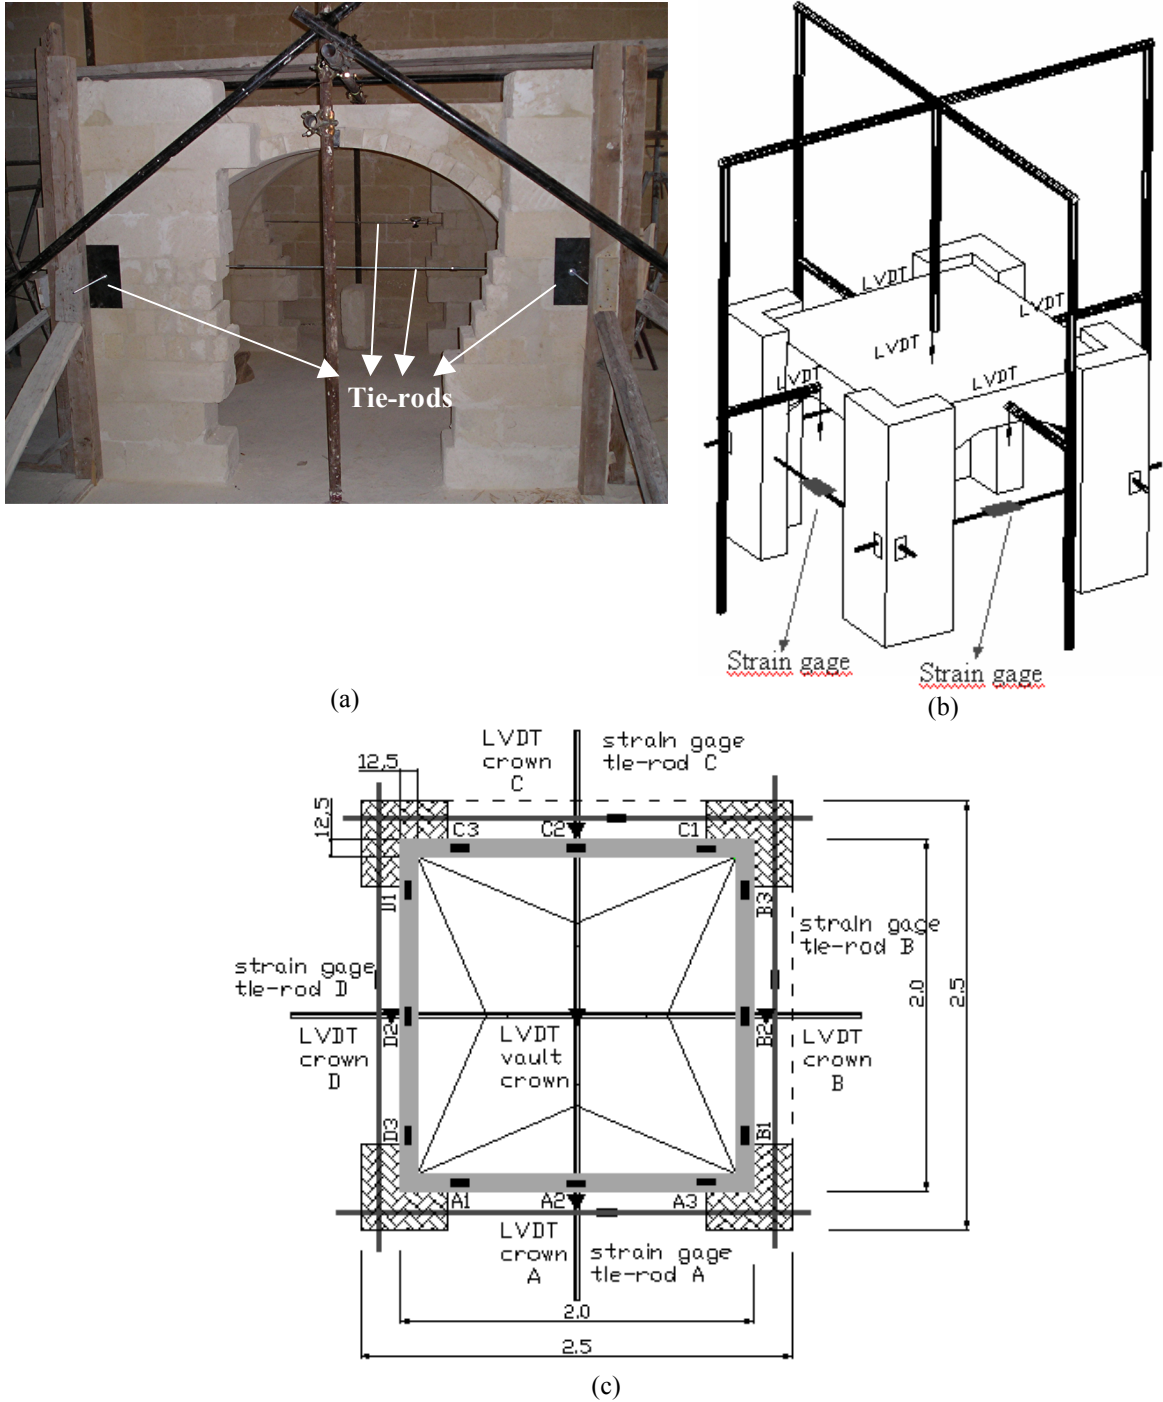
Test setup and instrumentation. (a) Unstrengthened vault with steel tie-rods, temporary wooden buttresses and frame of steel tubes used to fix the LVDTs. (b) Scheme of the instrumentation on the unstrengthened vault. (c) Strengthened vault with strain gages on the FRP sheet at various locations.
